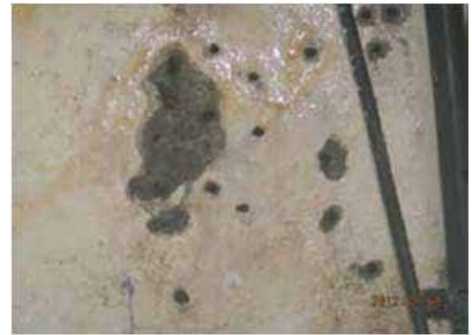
Water dripping point and accumulation of water of 12th floor roof ceiling
